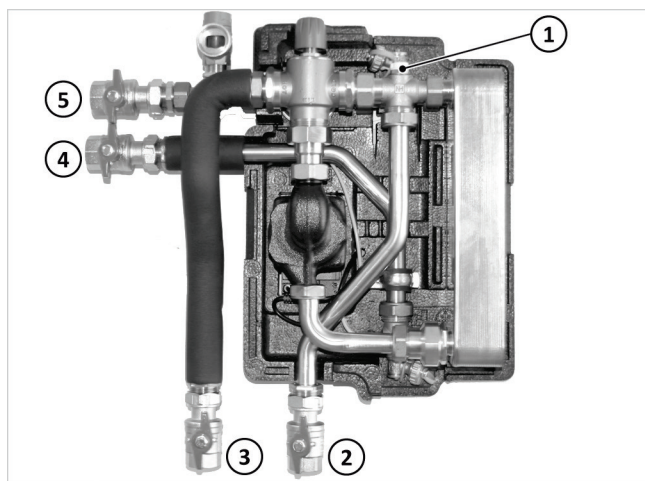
Position of the boiler filling and emptying valves and shut-off valves
